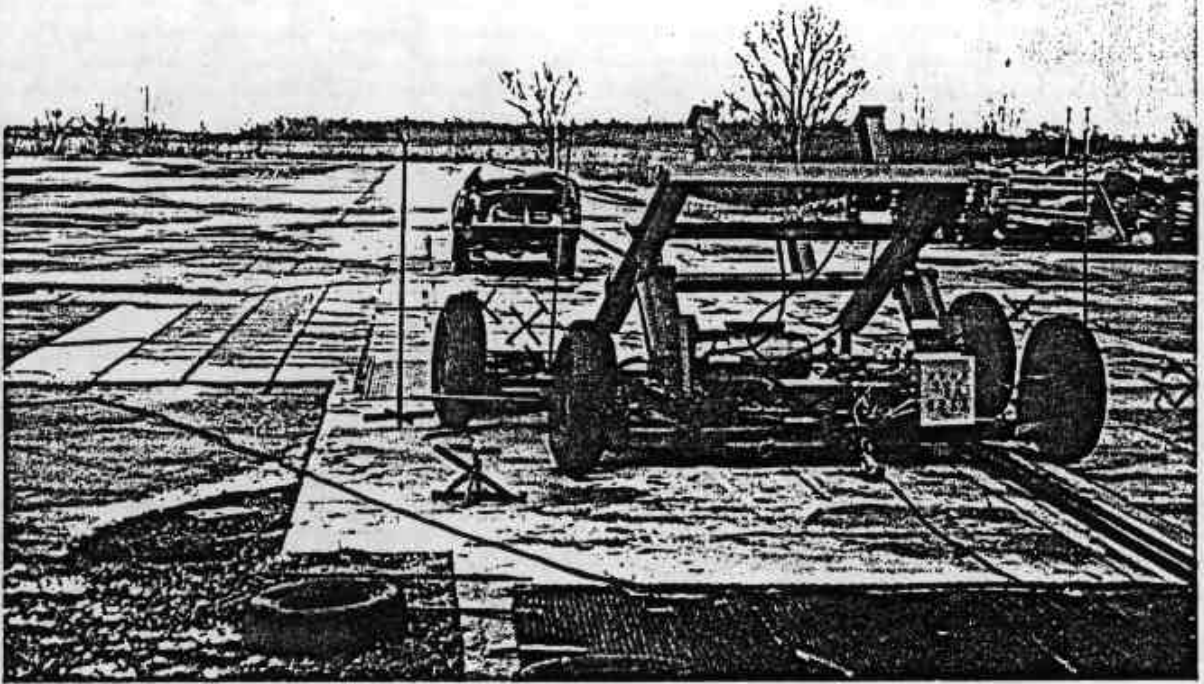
POST-TEST OVERALL REAR - VIEW 1
